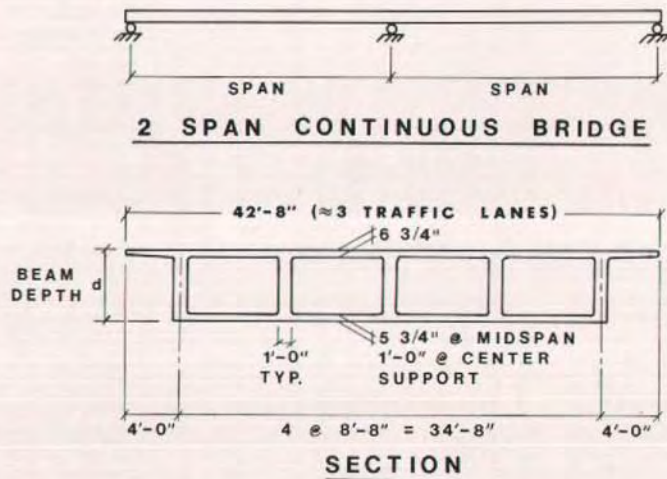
Two-span continuous post-tensioned box girder bridge.
